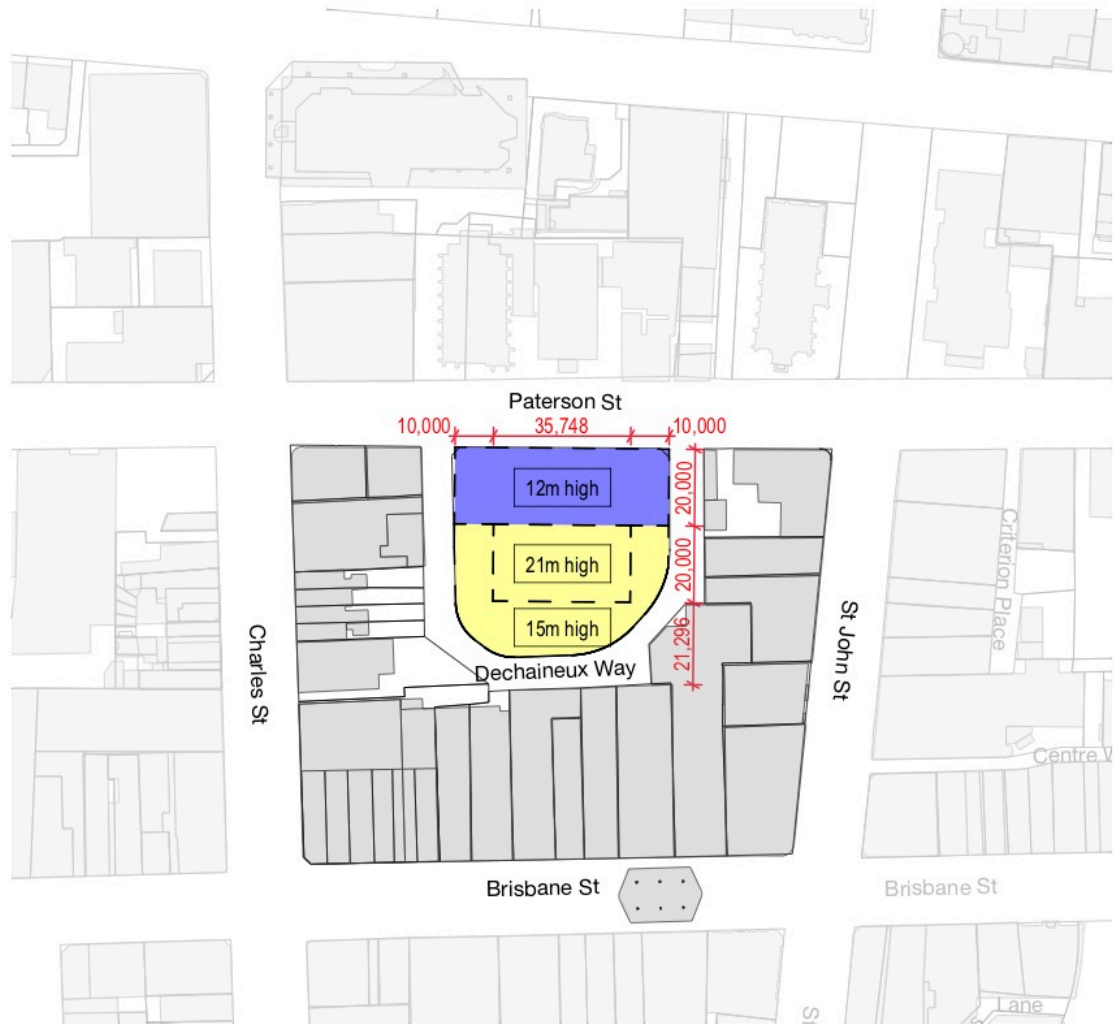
SITE C1 - OPTION 1 - Site Plan. 12m building height to street frontage, with 15m height setback 20m from Paterson Street and a 21m high building height at the centre of the site.
